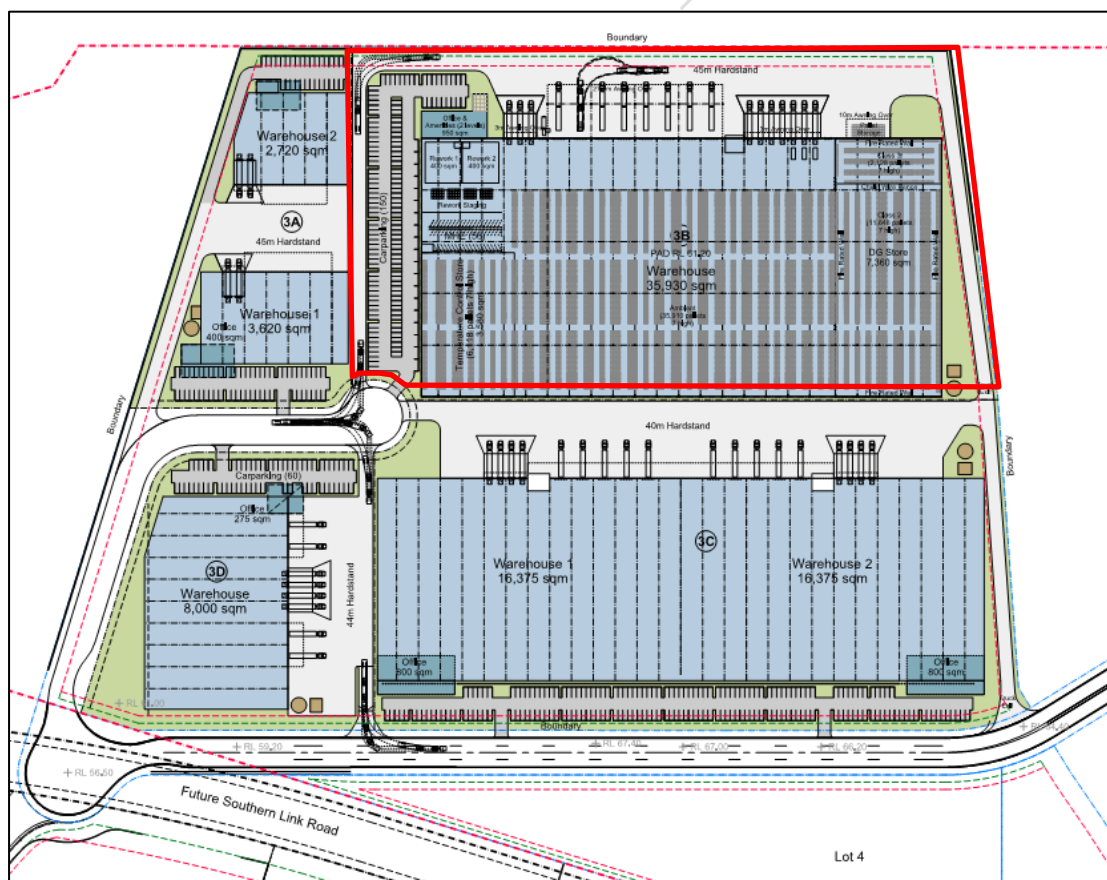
Proposed Lot 3 Layout (subject to this SSDA and the intended s96 to SSD 6078)
